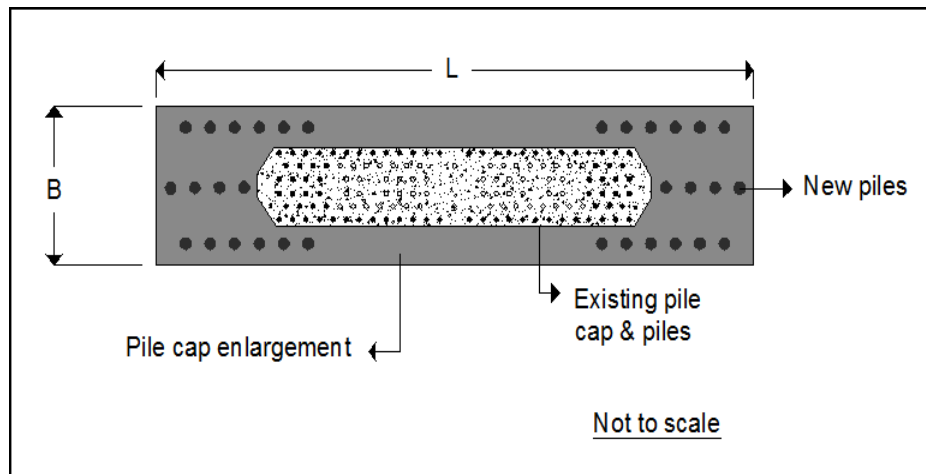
7. Pile caps and pile foundations strengthening, plan view.
